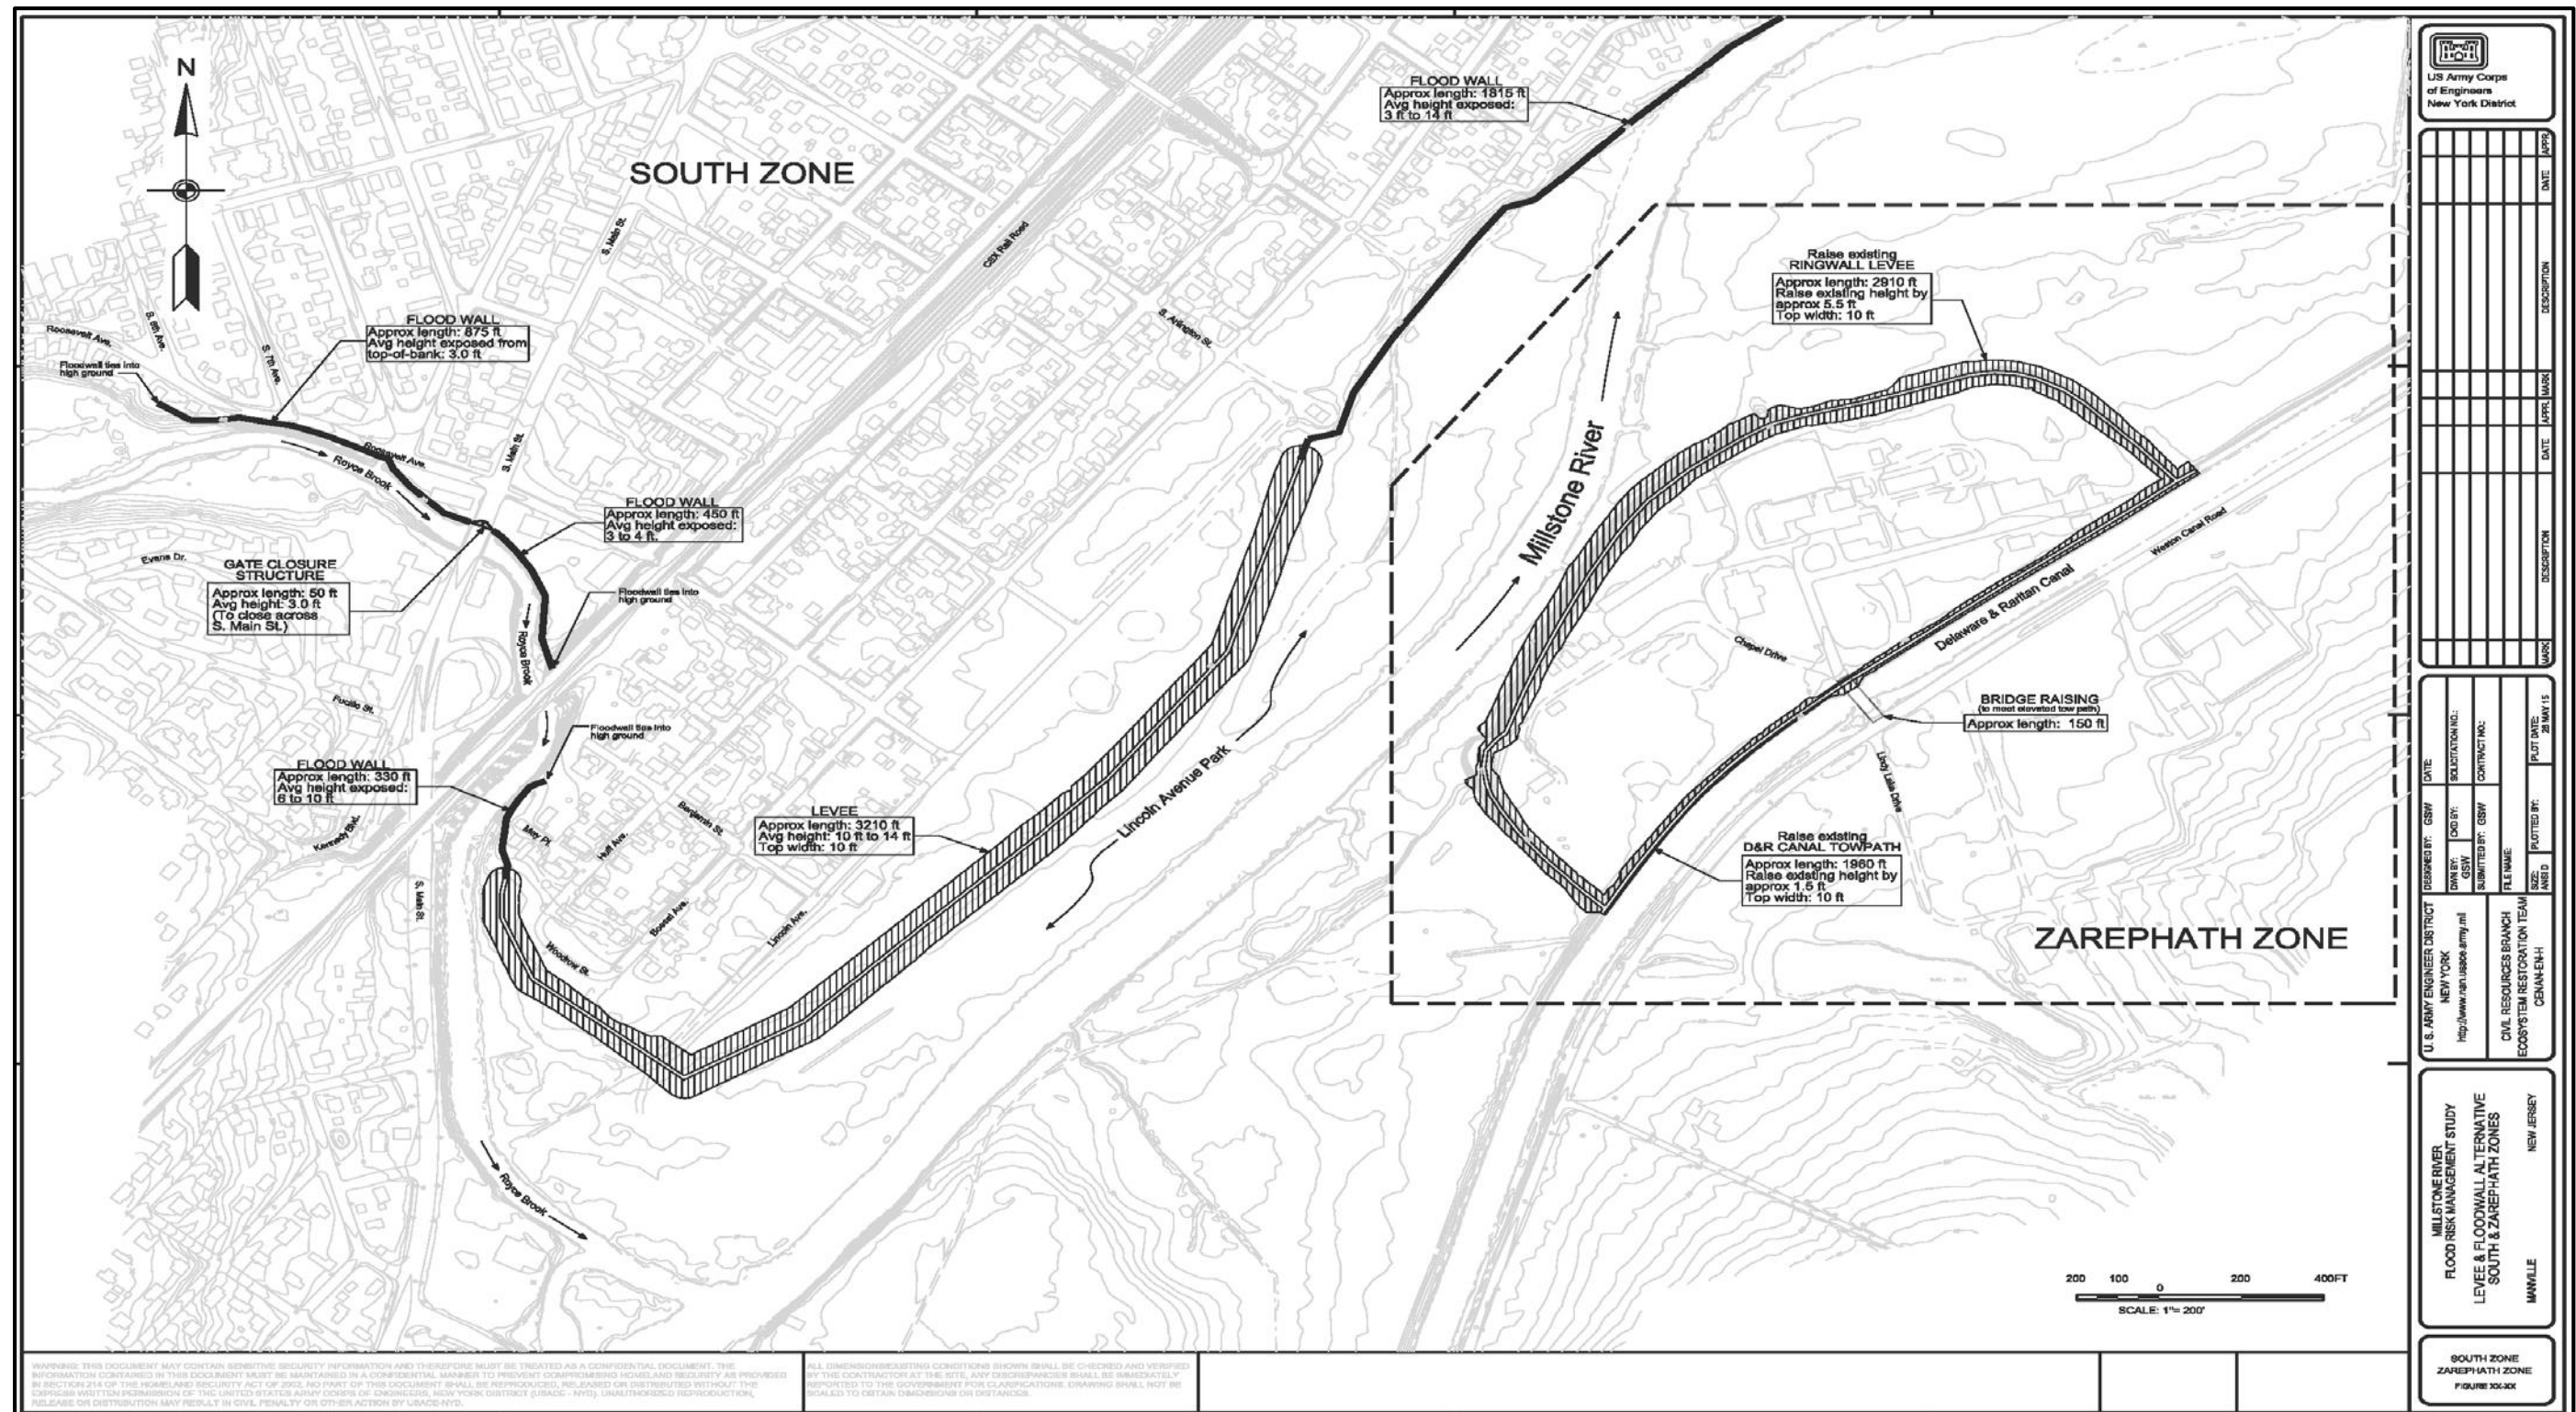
LEVEE & FLOODWALL PLAN LAYOUT (SHEET 4 OF 4)
